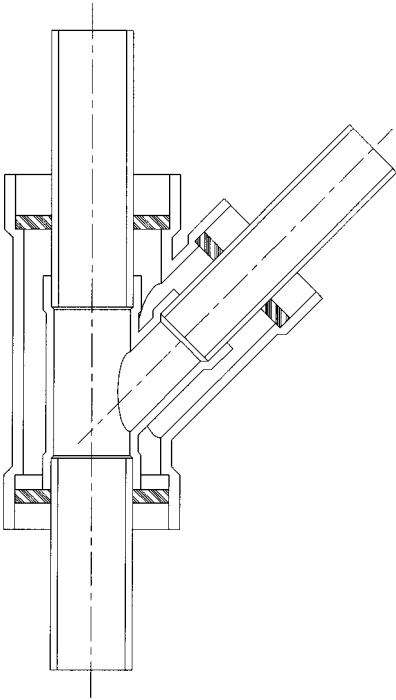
Example of thermoplastic 45° reducing lateral (wye) using molded code approved carrier fitting. (*Orion Fittings, Inc.*)
